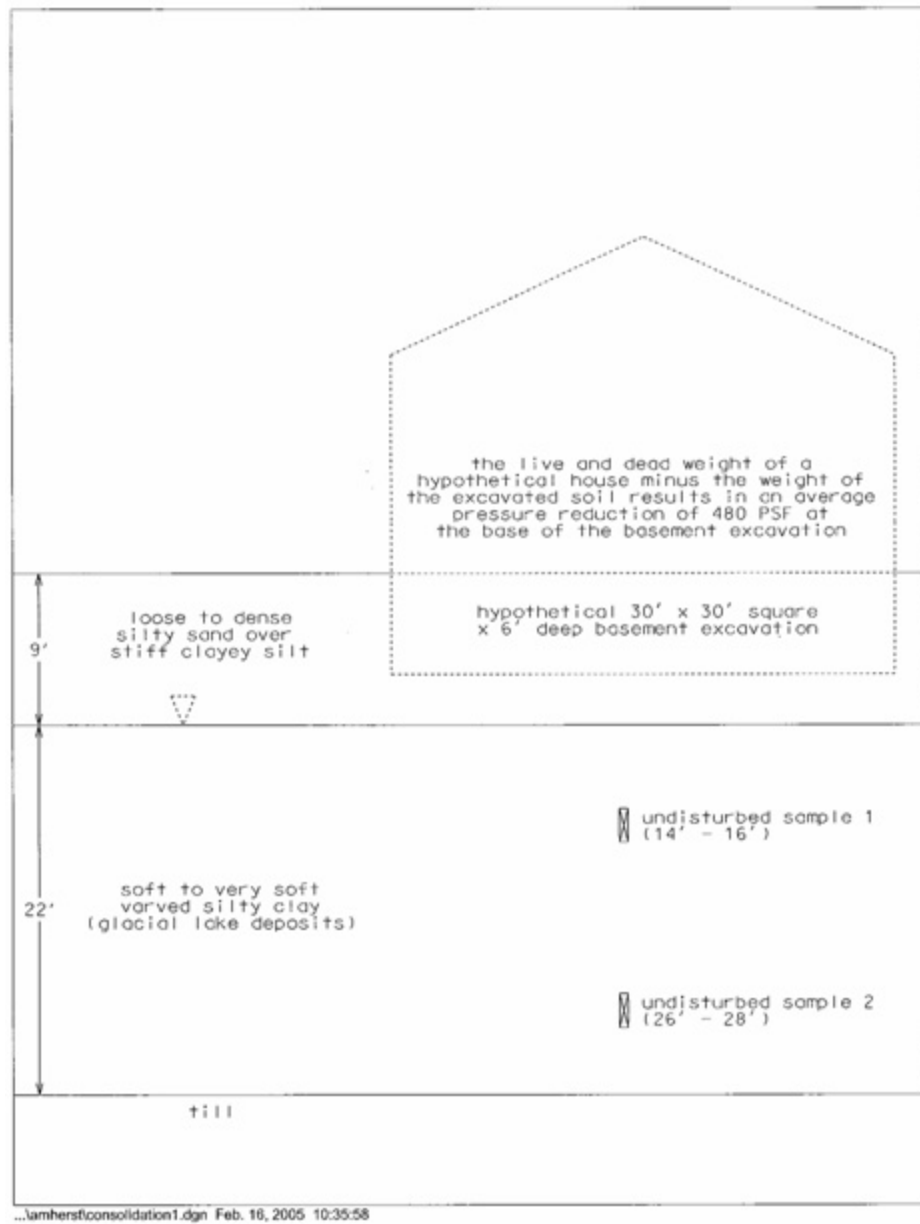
Schematic of hypothetical square house located within a 30' x 30' x 6' deep basement excavation (Section 3.4.3.2).
